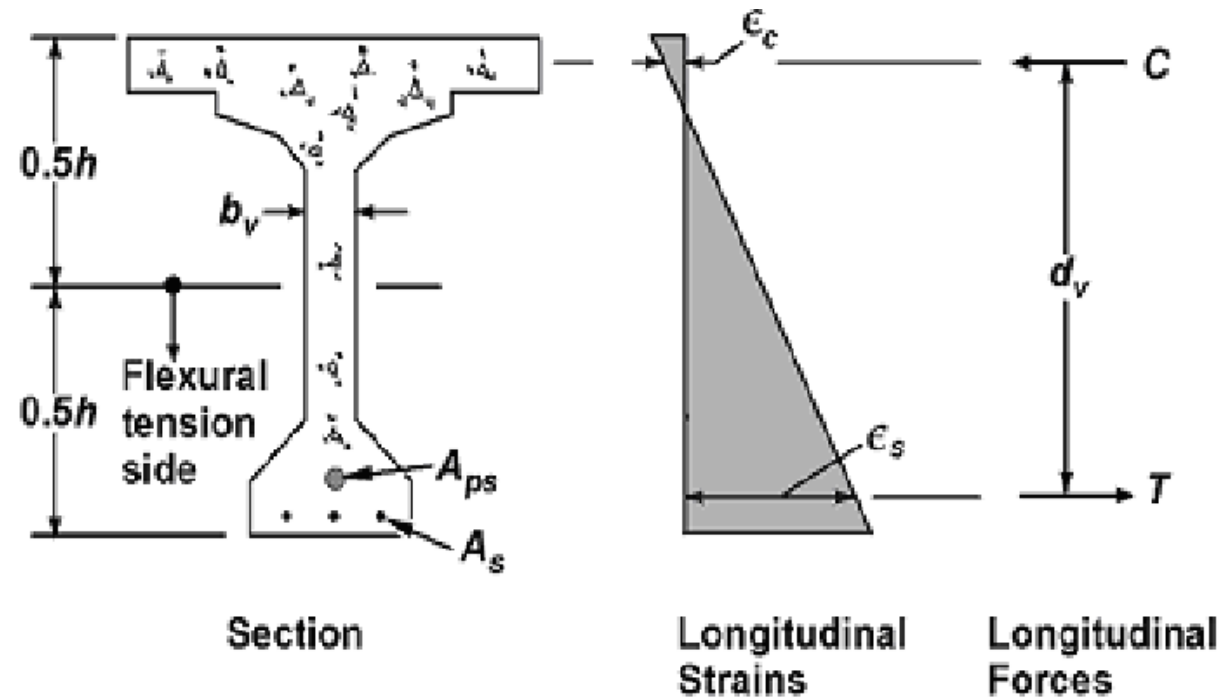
Longitudinal Strain,  $\epsilon_s$ , for Sections Containing Less than the Minimum Amount of Transverse Reinforcement
